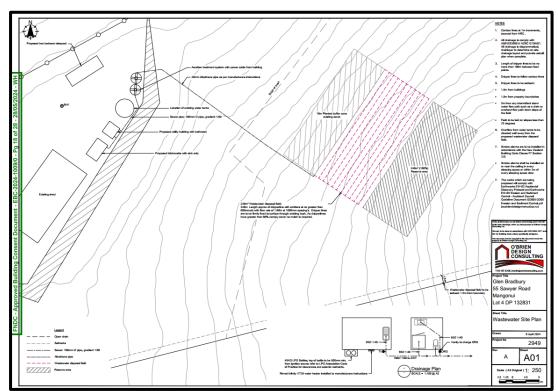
Approved site plan under EBC-2024-1009 showing septic system location.
